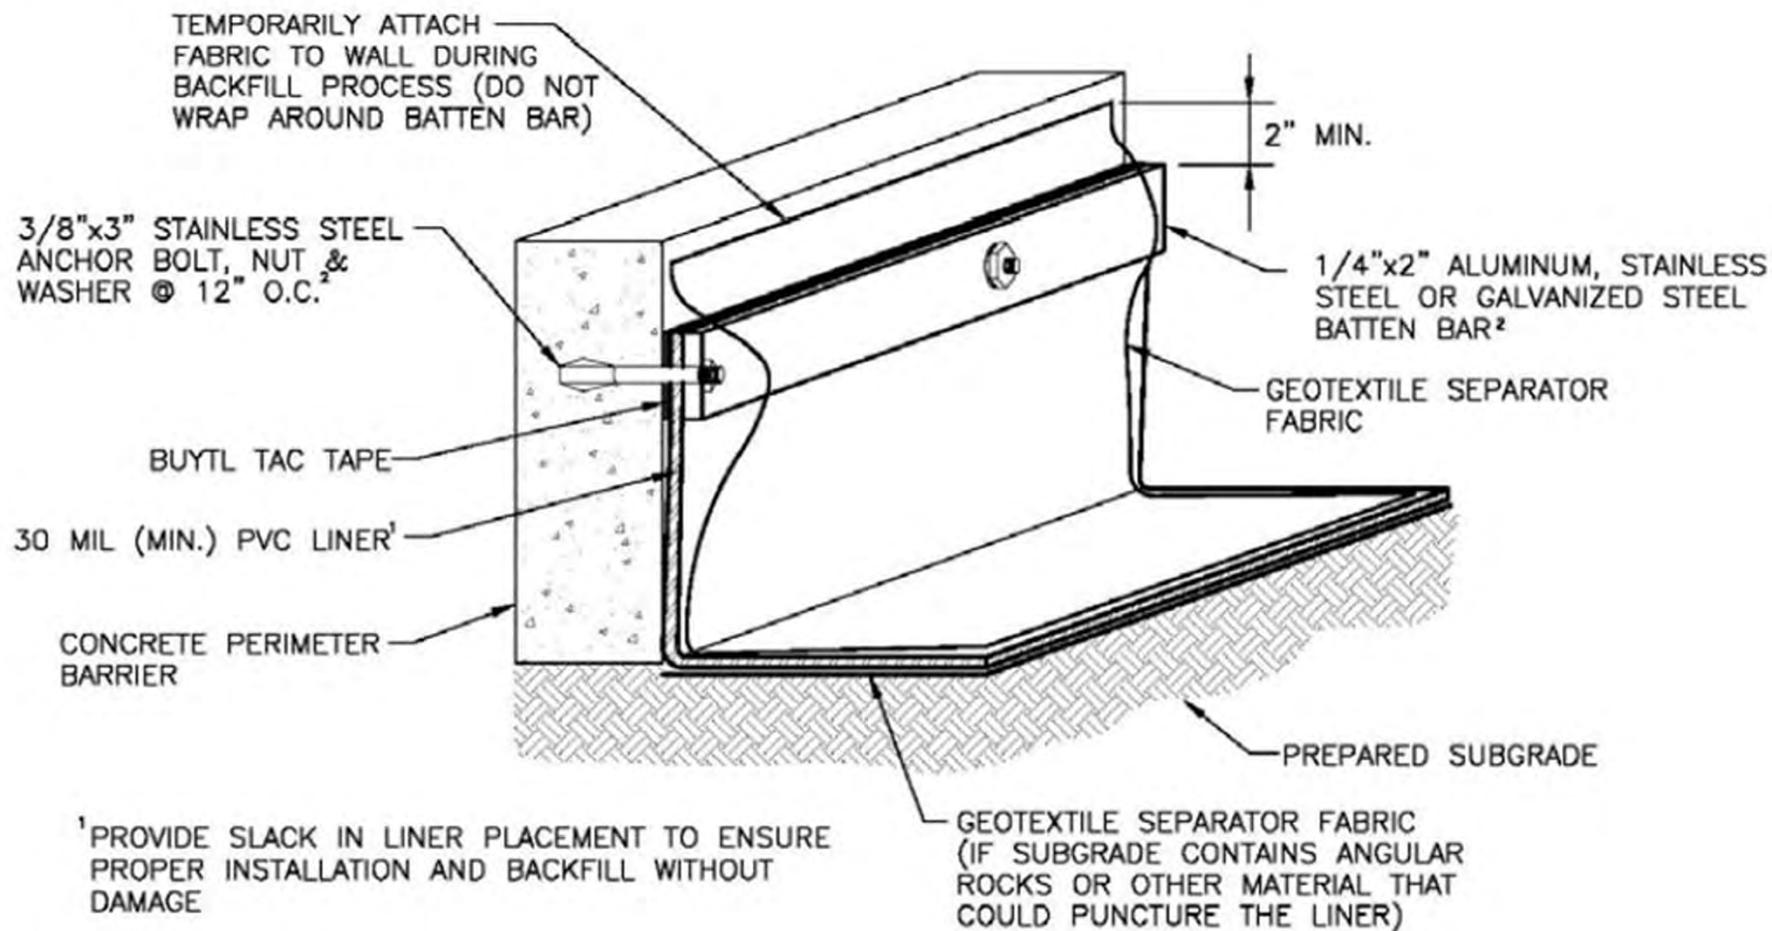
Geomembrane Liner/Concrete Connection Detail
